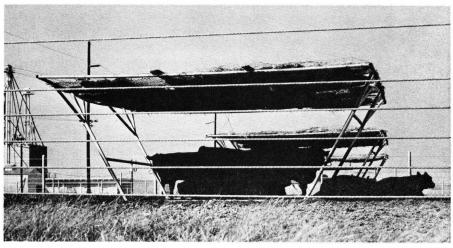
Shade shelter constructed of wire and pipe in a commercial feedlot.
